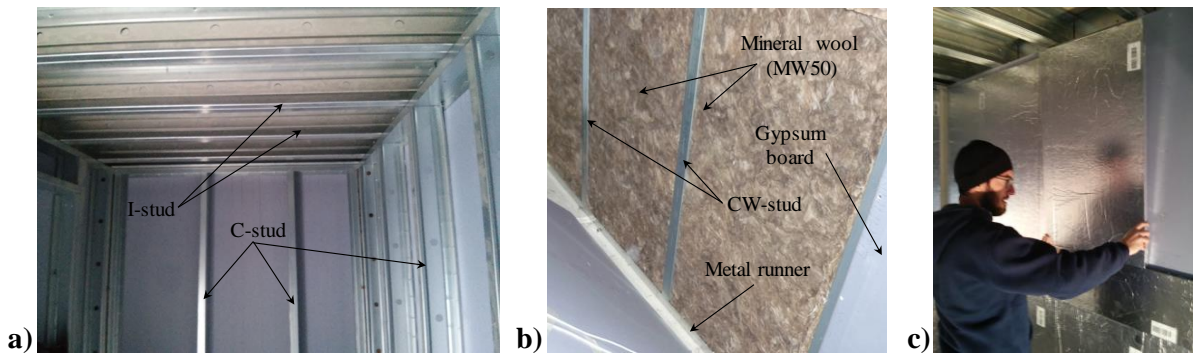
Construction of walls: a) load bearing metal structure, b) installation of VIPs and c) installation of non-load bearing part of the walls.
